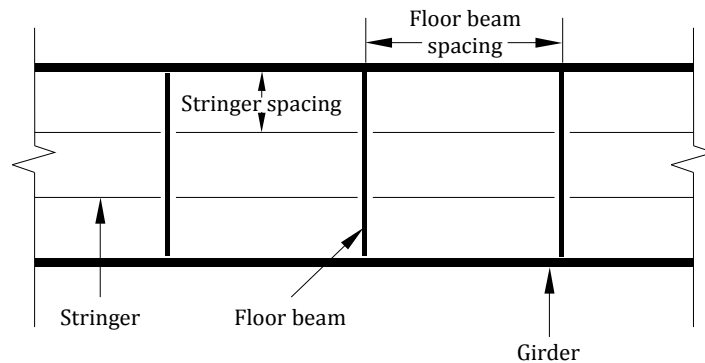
Twin girder steel bridge floor system, *ad.* (Pennings *et al.* 2000)
